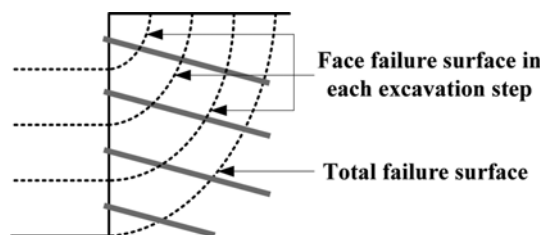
Change of Failure Surface in Each Excavation Step
